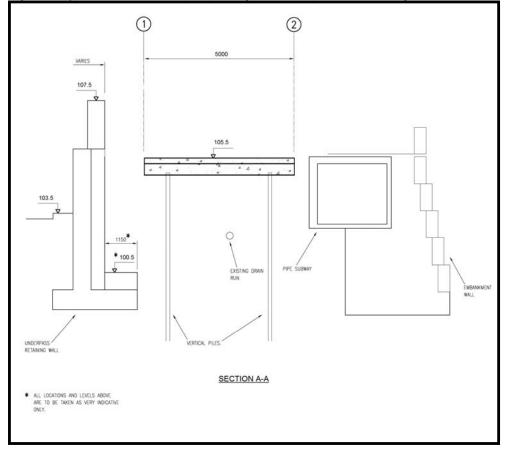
Typical cross-section (N-S) through the example site exhibiting site constraints.
